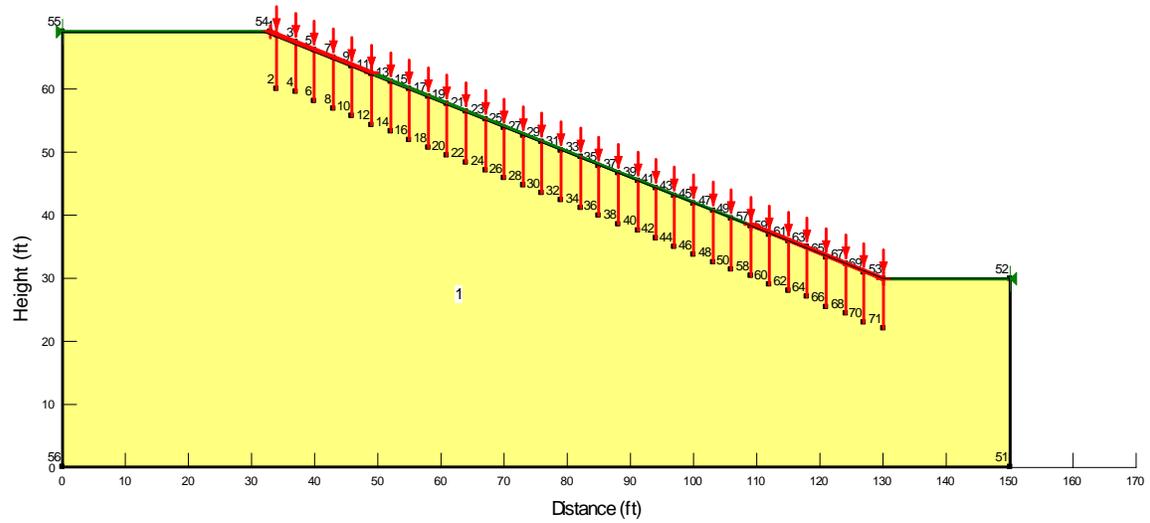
Geometry of STH-164 highway slope that consists of one soft homogeneous soil layer stabilized with vertical structural members.
